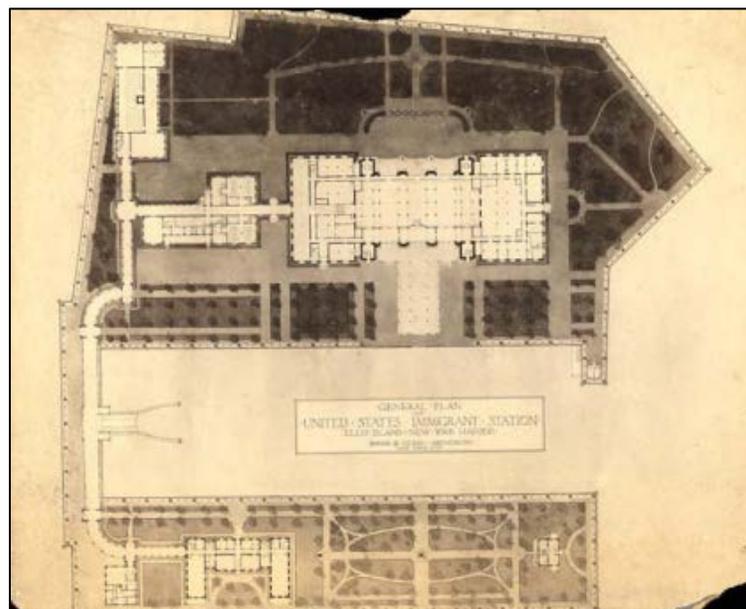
This image shows the revised hospital design and site plan proposed by Boring & Tilton c. 1899.
